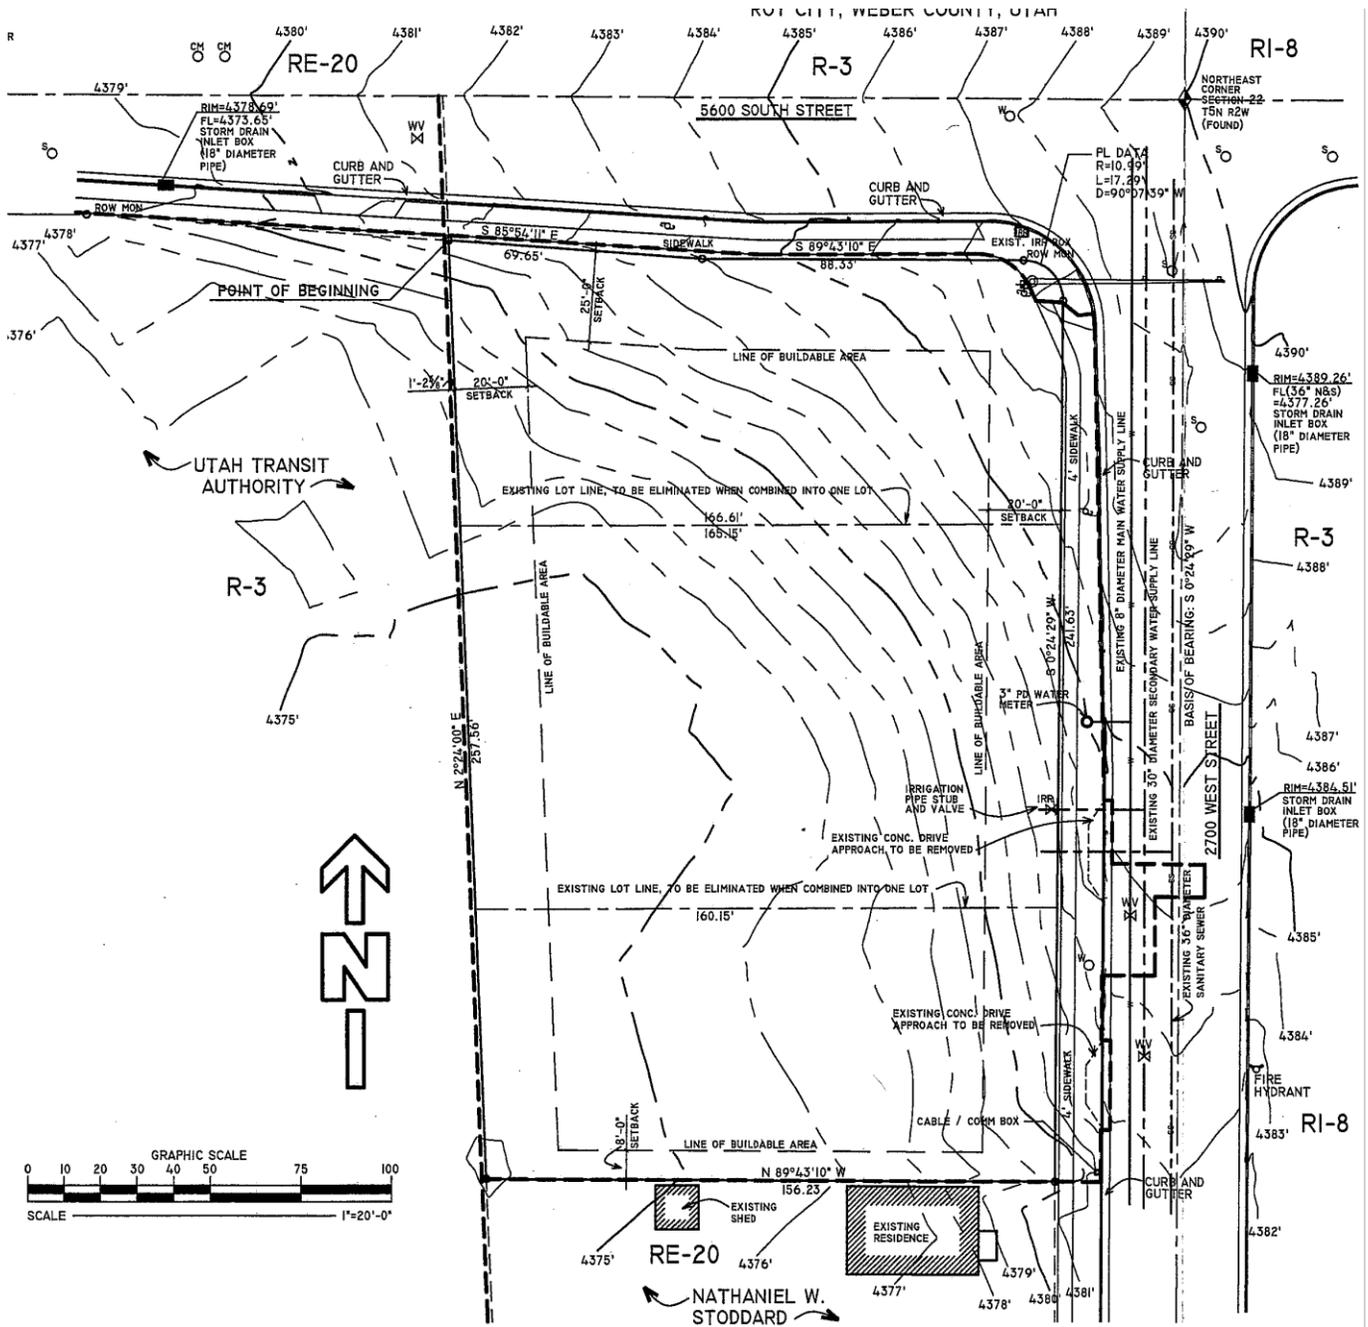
EXHIBIT "B" - PRELIMINARY SUBDIVISION PLAT
